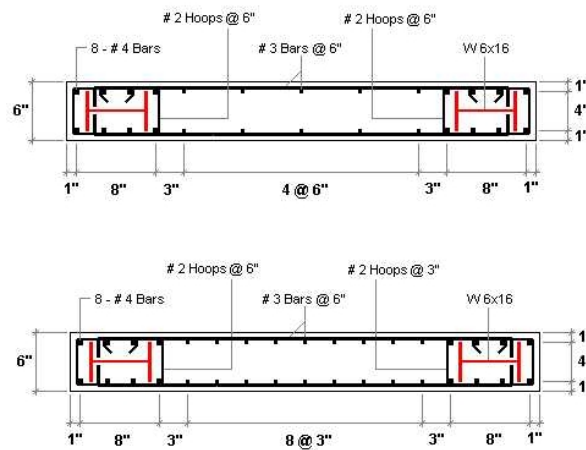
Geometry and Reinforcement for SRC Wall Test (Specimen SRCW-2)
